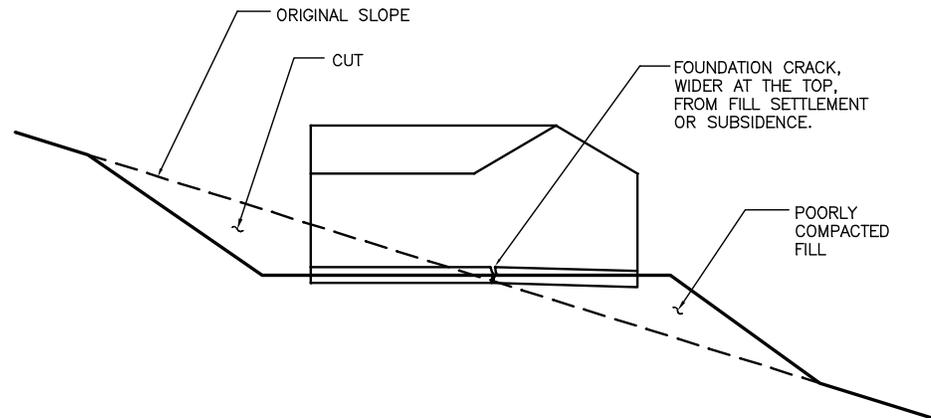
Foundation crack patterns indicative of fill settlement at a cut-and-fill house site (from ATC, 2002).
